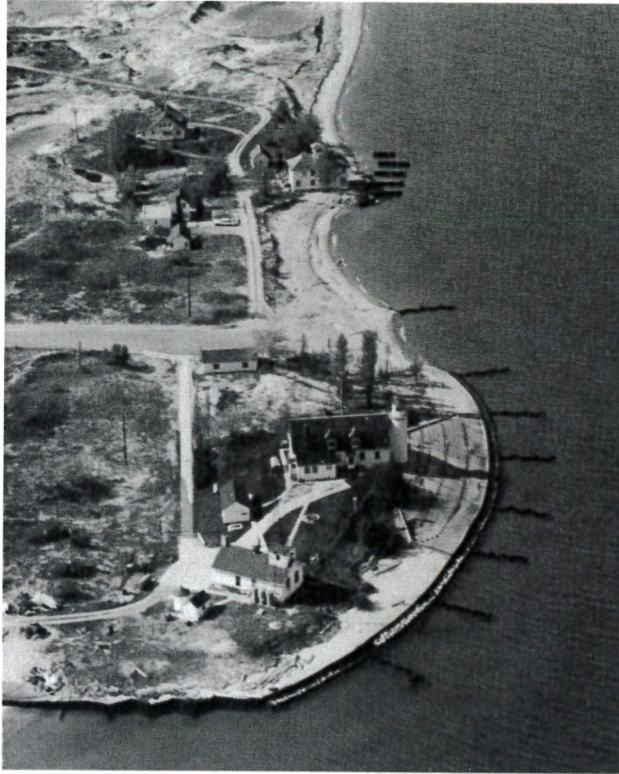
Undermining, Breaking and Settling of Concrete Apron, August 1947
